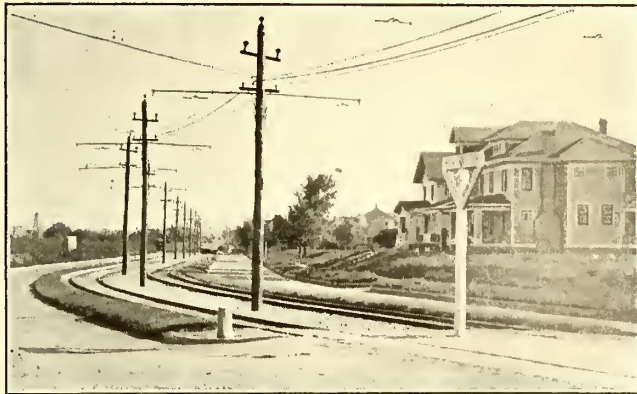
Oklahoma Track—Parked Private Right-of-Way Construction
